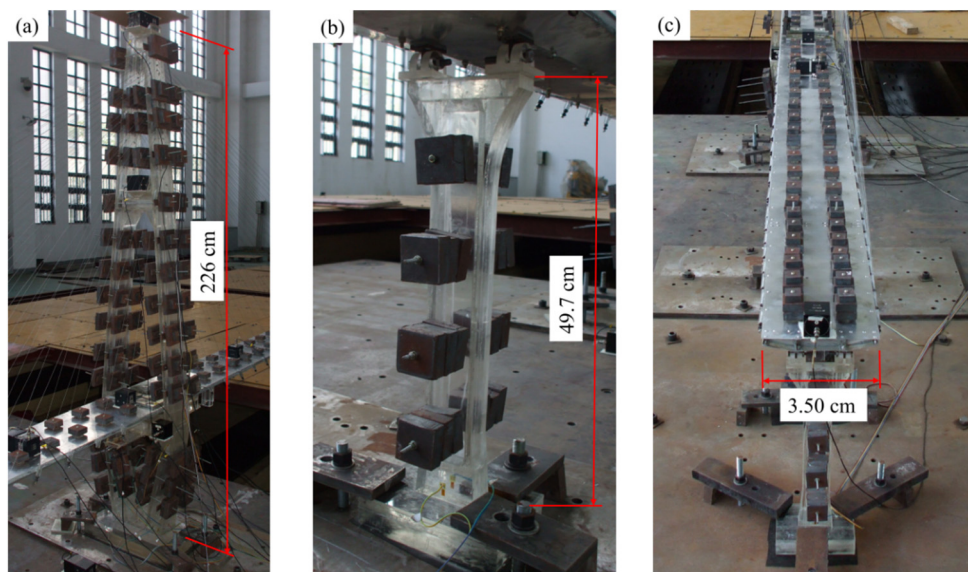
Arrangement of steel blocks for (a) tower; (b) pier and (c) girder.
